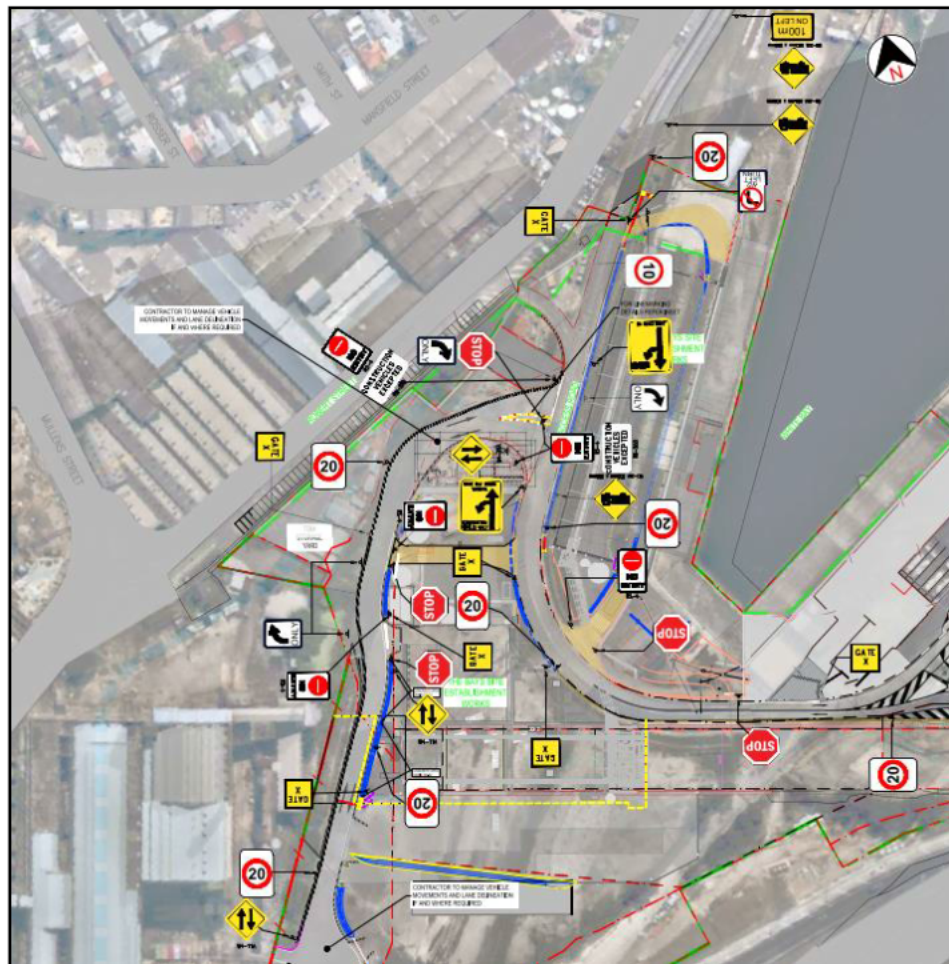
INDICATIVE LAYOUT OF THE BAYS CONSTRUCTION SITE
